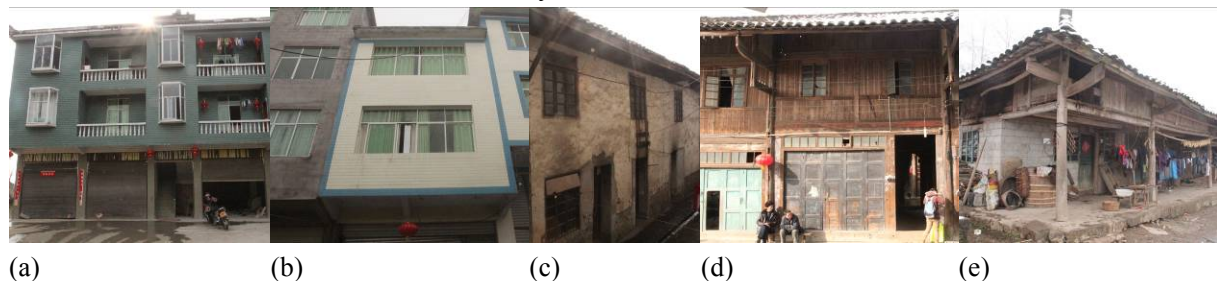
Five typical rural houses of different envelopes (a) and (b) Cement brick with ceramic tiles; (c) Stone; (d) Wood; (e) Partly wood and partly cement brick
